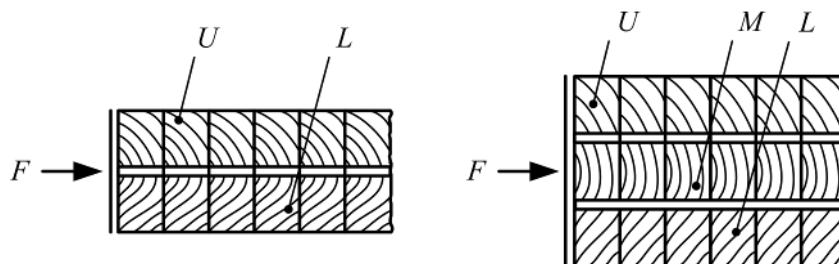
Test bars to be cut from a full cross sectional specimen
